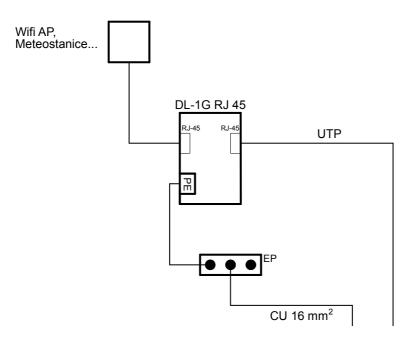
An example of installation of SPD under the roof of a house (in the loft)
